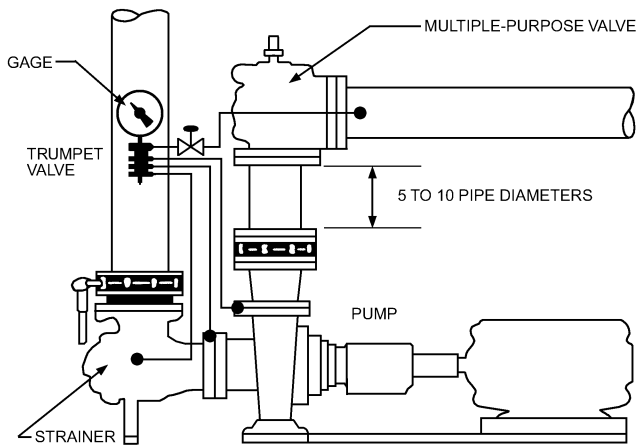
Typical Multiple-Purpose Valve (Angle Pattern) on Discharge of Pump
